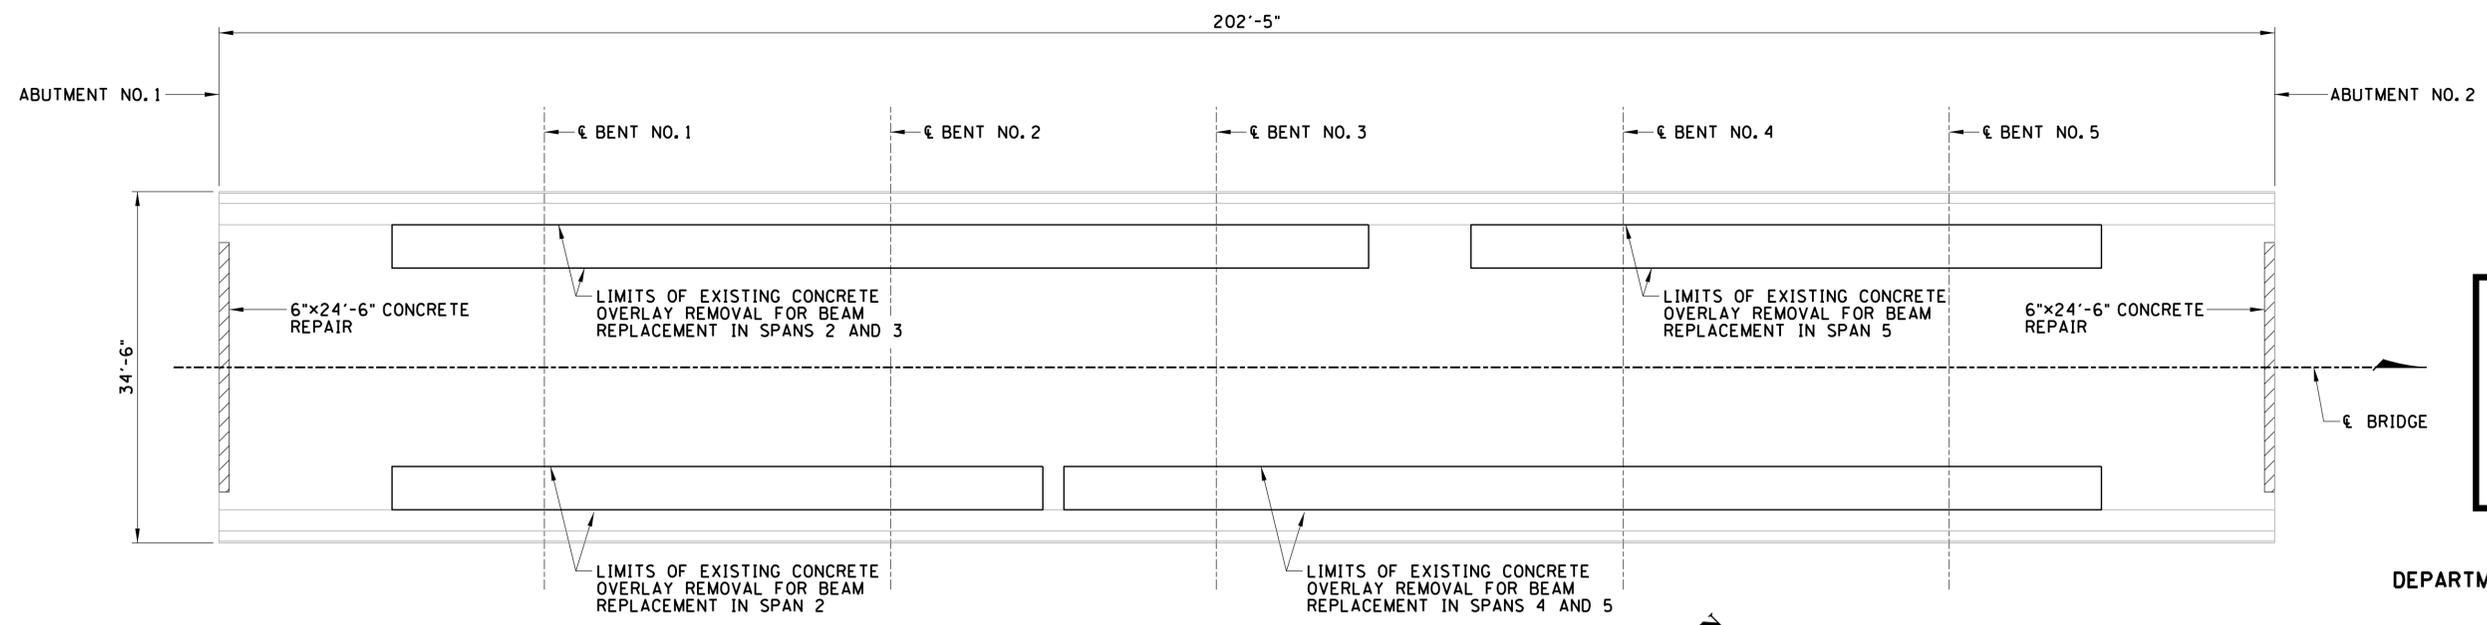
DETAIL SHOWING PARTIAL DEPTH DECK REPAIR
